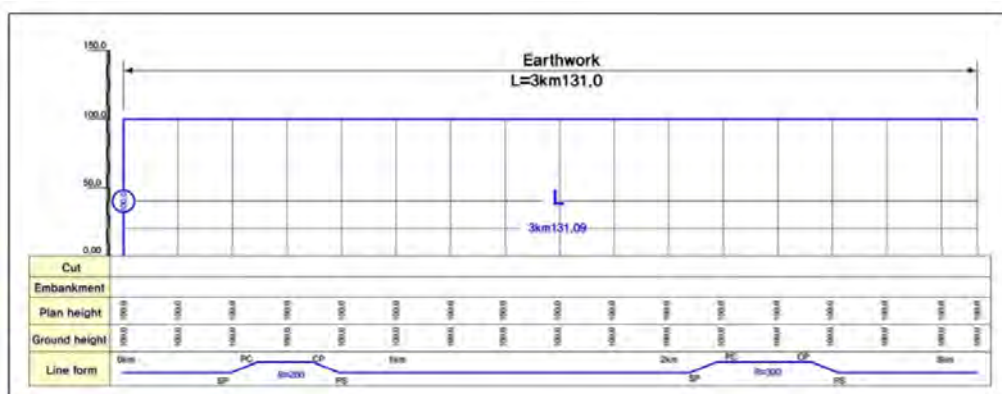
Section Proposal of Initial Track Layout – At-grade Case
